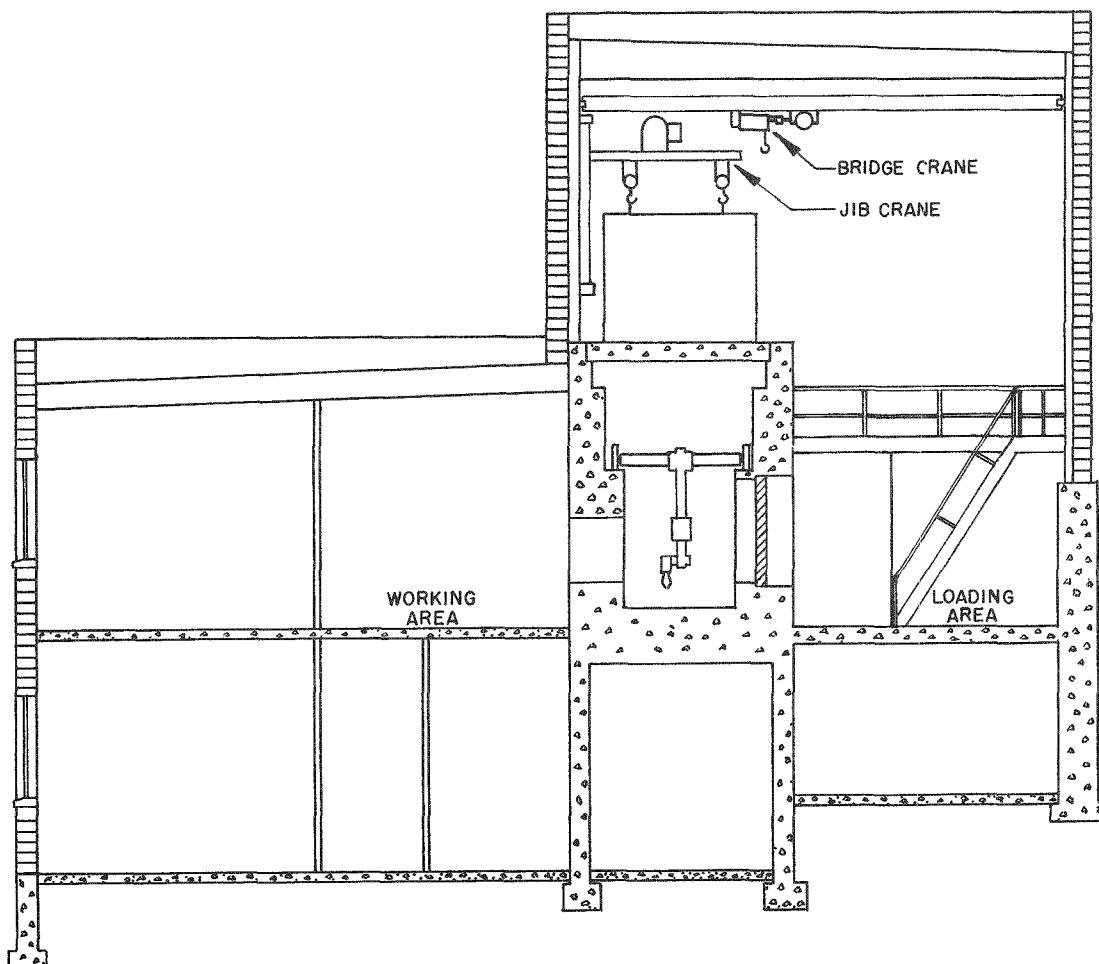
Vertical section of general-purpose hot cells, Solid State Laboratory, building 3025, Oak Ridge.
